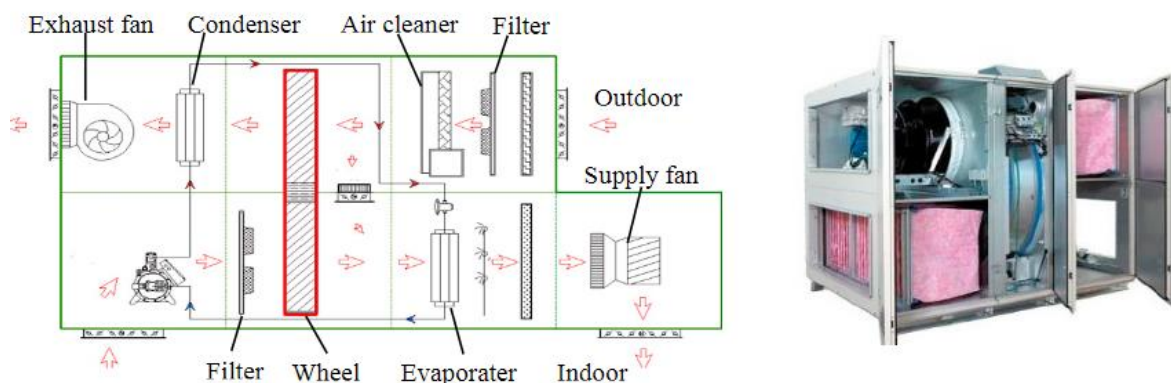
Using the rotating wheel heat exchanger to reduce the cooling load on the chiller system [7]
